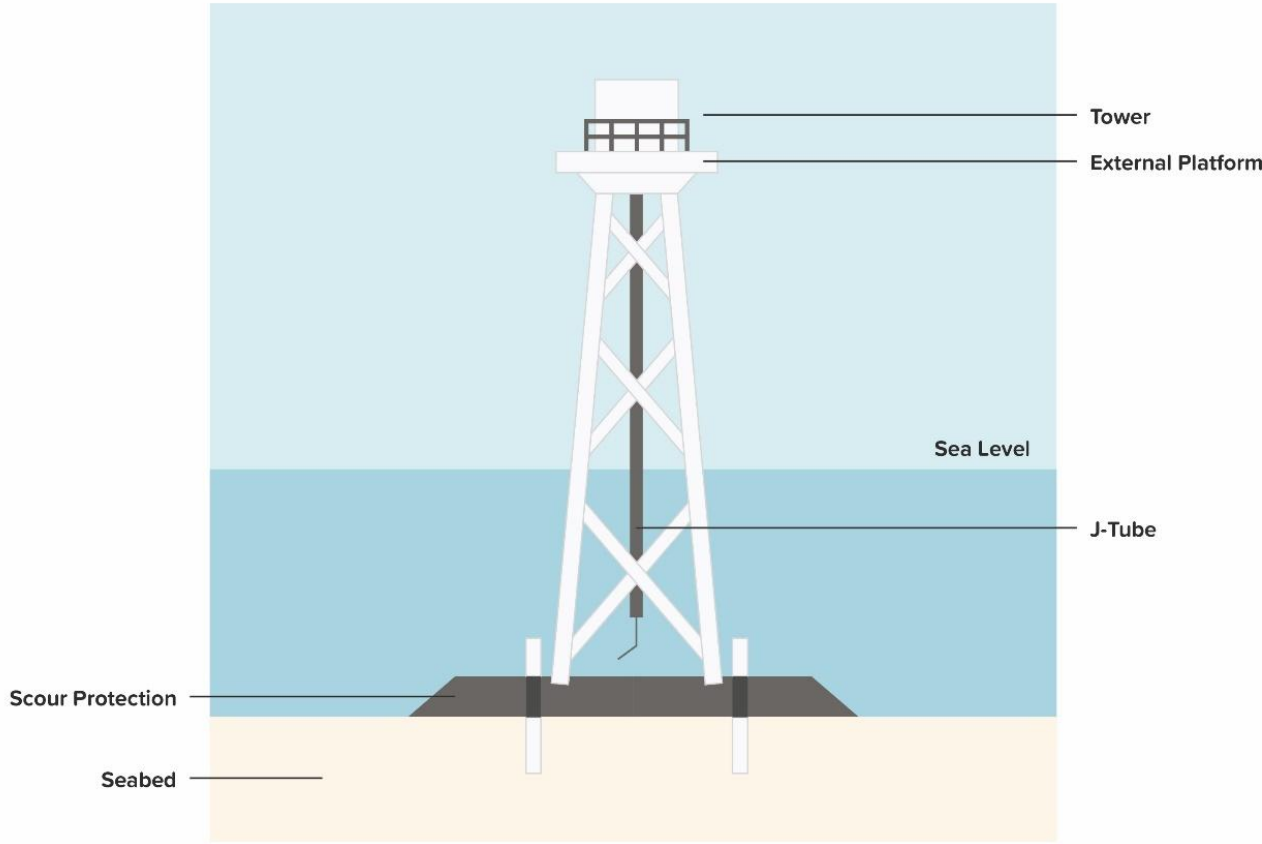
Indicative Piled Jacket Foundation Schematic
